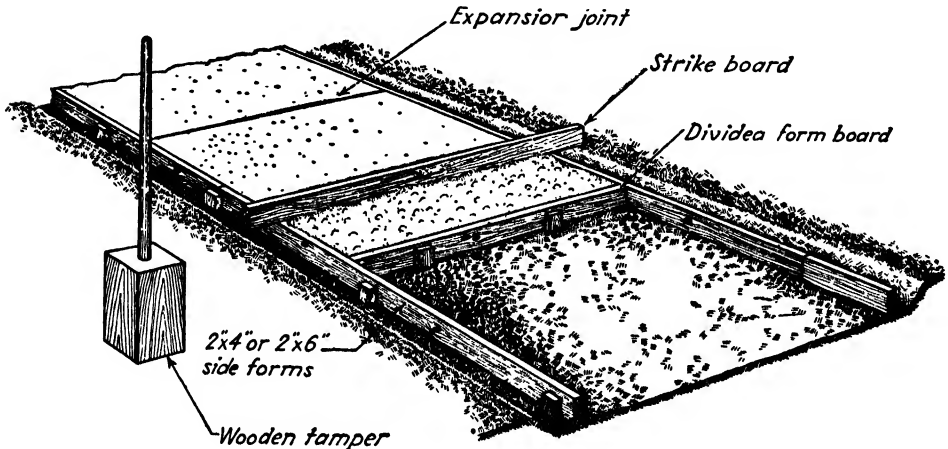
Forms for a concrete sidewalk. Concrete walks are often poured in alternate sections. After these harden, the intermediate sections are poured. (Portland Cement Association)
